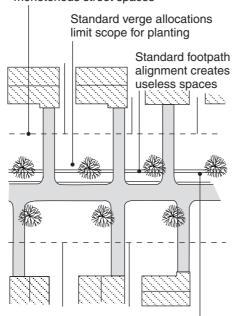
and 5.8 illustrate the application of water sensitive design to streetscape layout and design.
